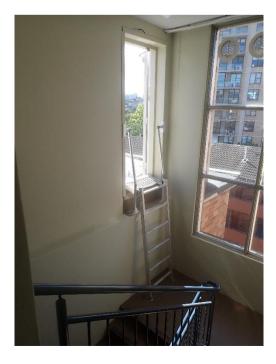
Ladder and access Door to the roof top located within the existing stairwell (Common Property)
